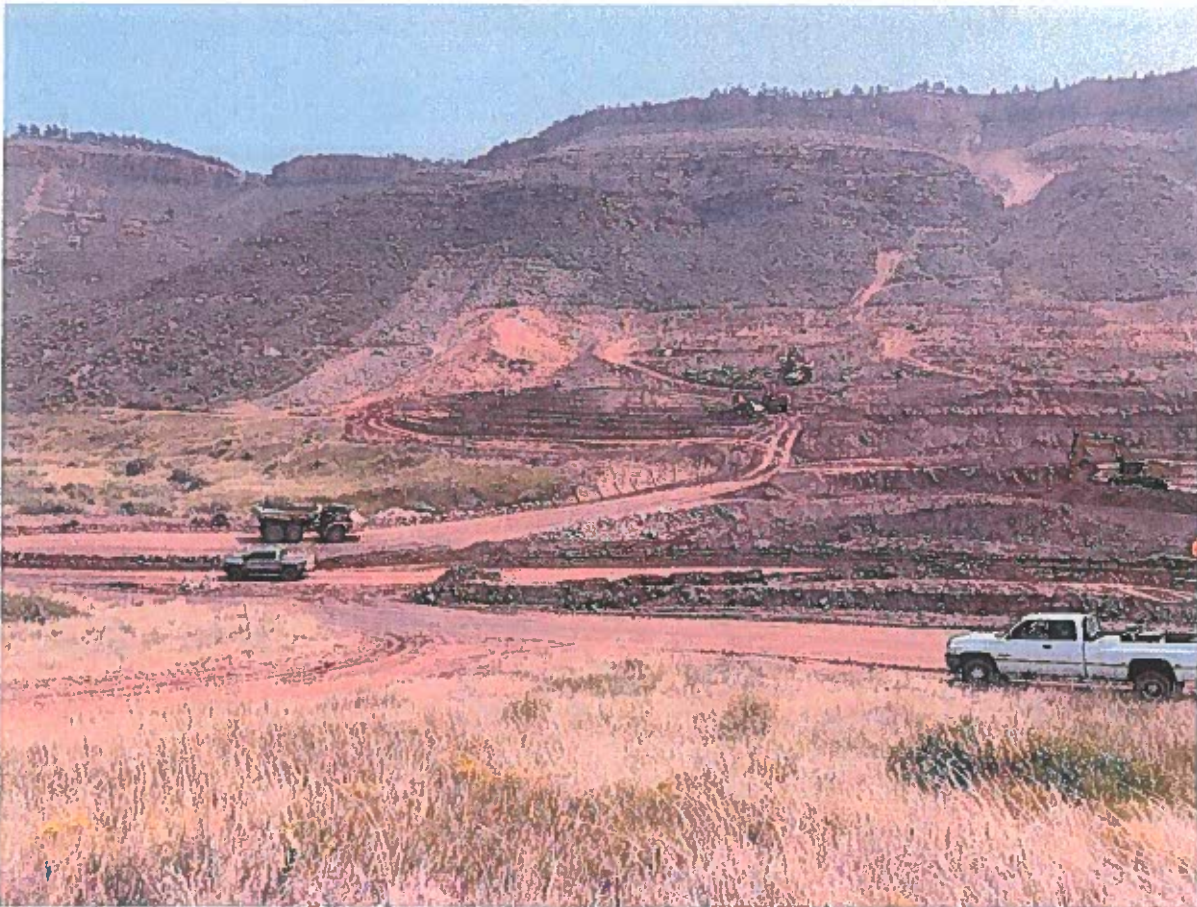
Main Dam Common Excavation at the Downstream Right Abutment
